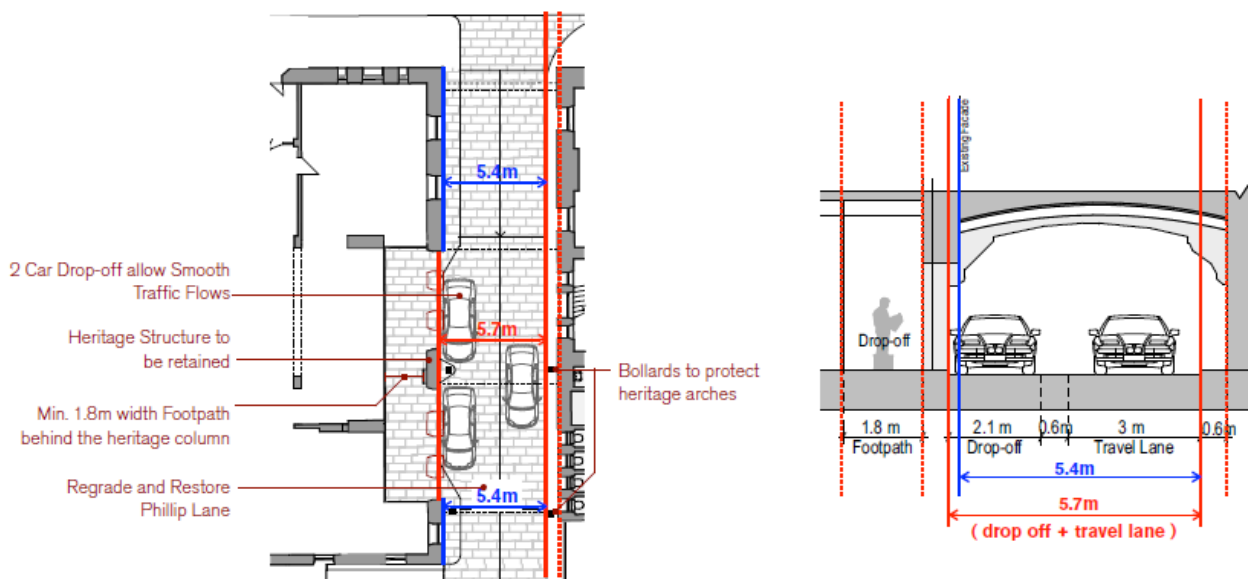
Hotel Pick-up and Drop-off Arrangements on Phillip Lane
